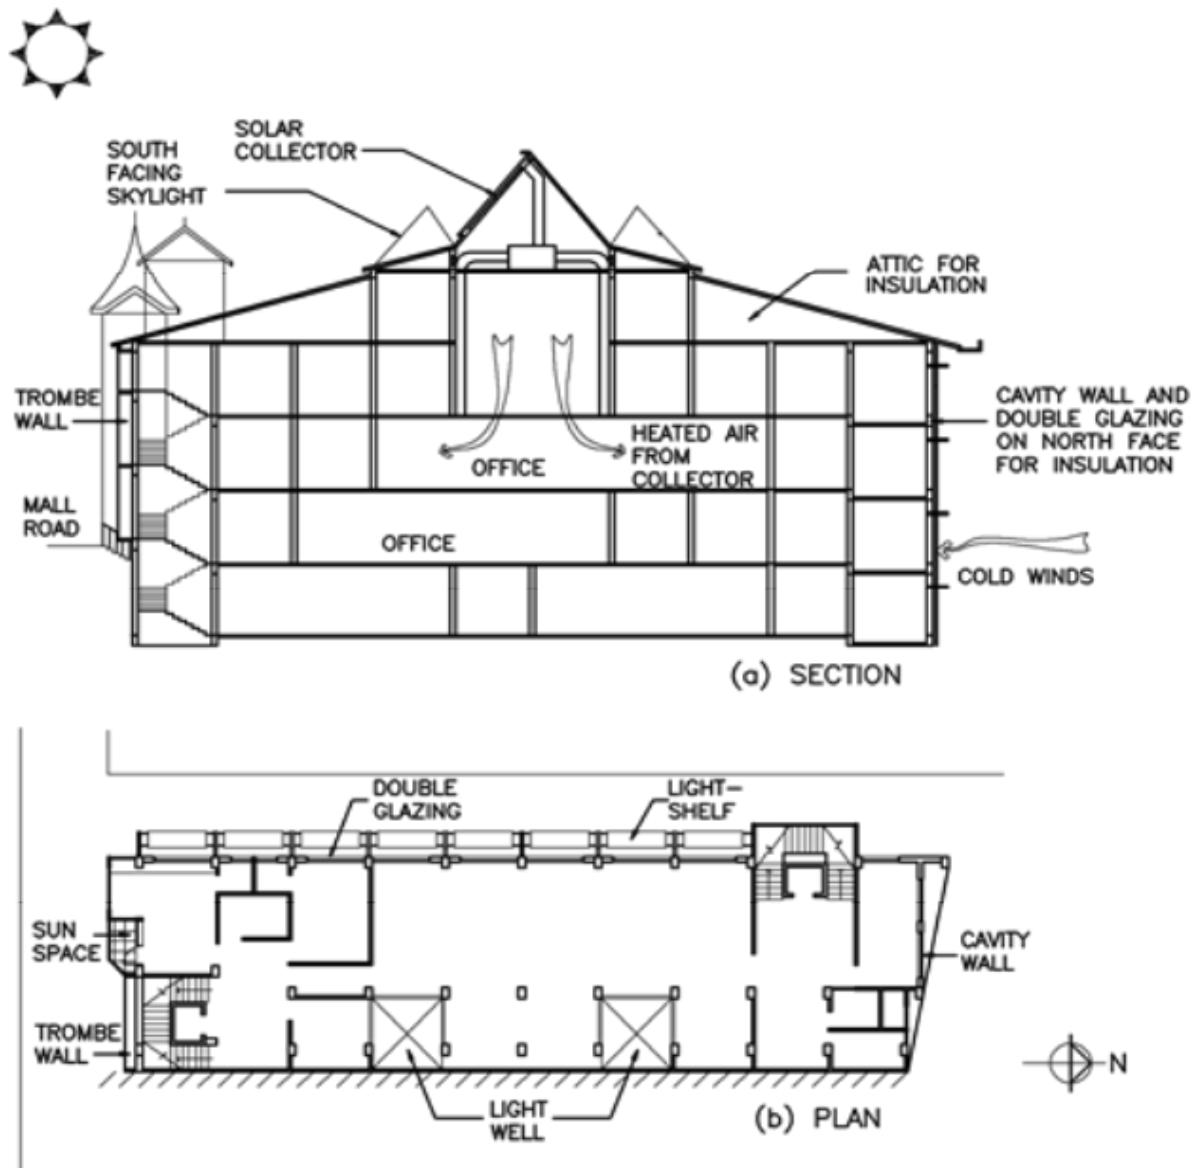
Section and plan of H. P. state co-operative bank, Shimla
